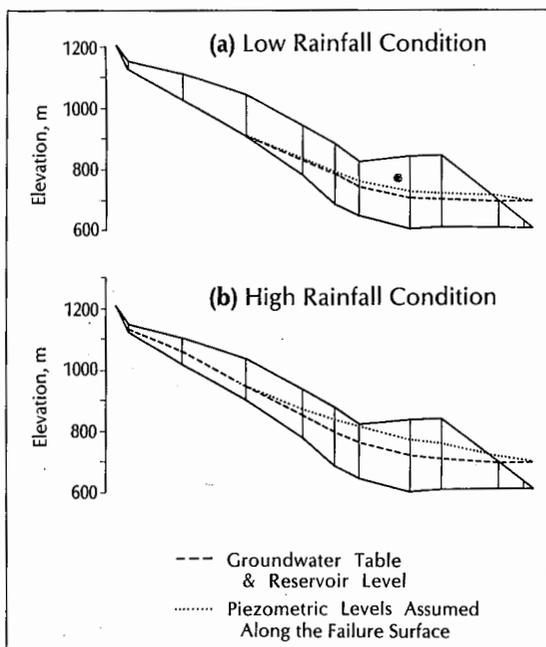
Piezometric levels used in stability analyses for Section 2, at a reservoir elevation of 710 m.
